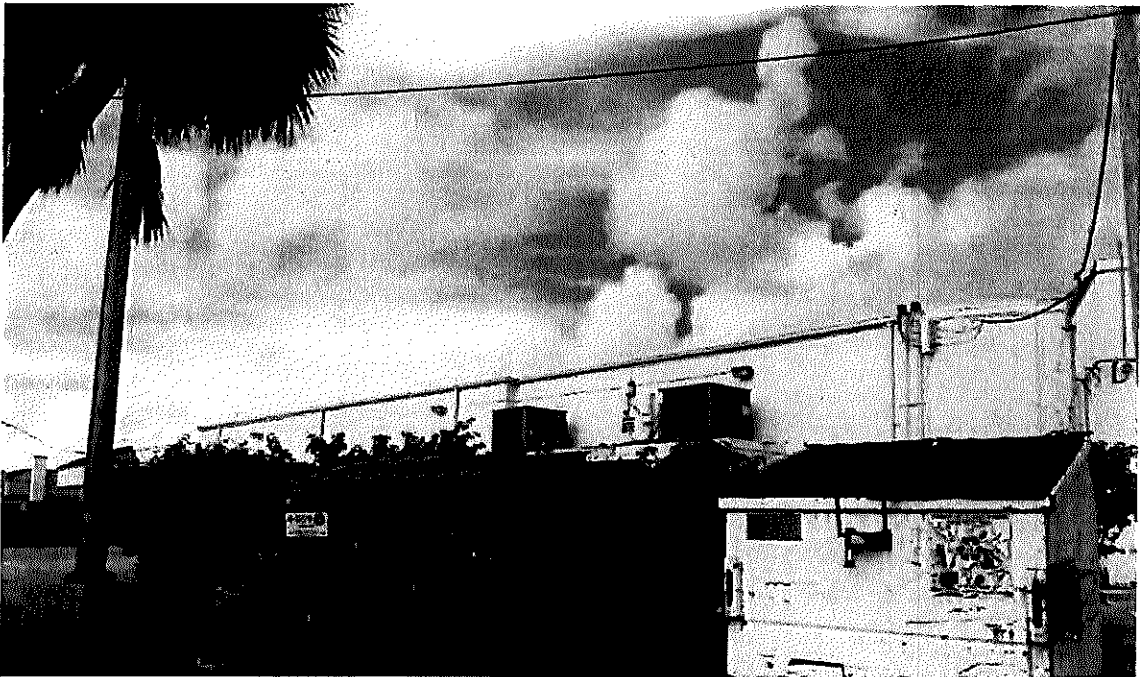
h Court obsolete and outdated building facade facing Prosperity Farms Road - In addition to inadequate ventilation and light.
